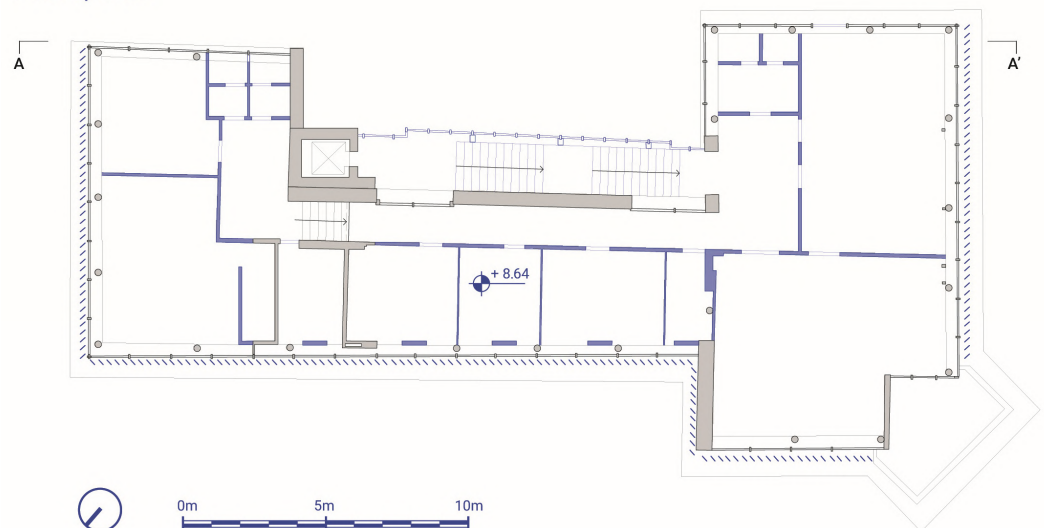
Original and current floor plan configurations of the Olivetti administration office building Villa Casana, with transformations highlighted in blue. Source: elaboration by the authors.
